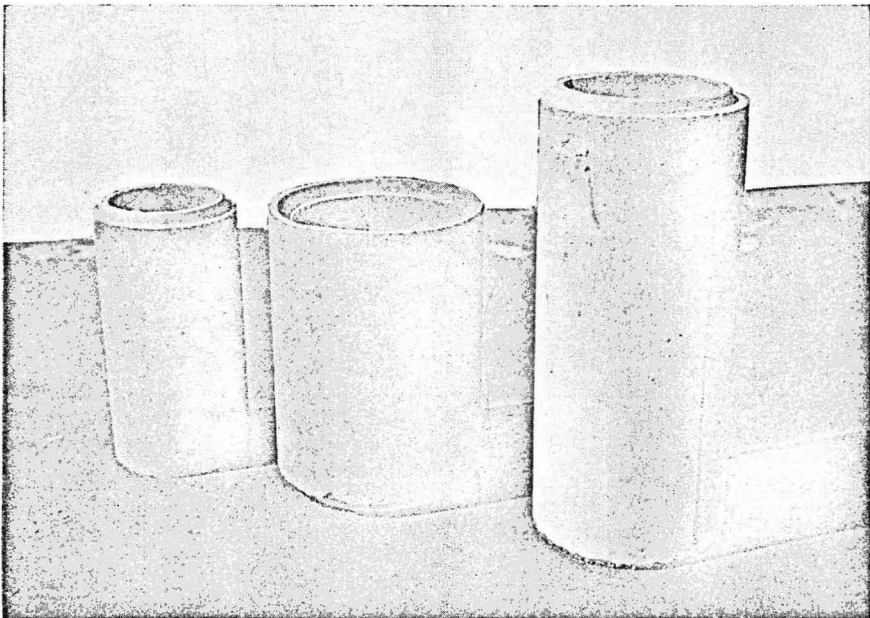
Handmade concrete pipe with tongue and groove joints. The section at the right is wet poured. The other two are hand tamped.
